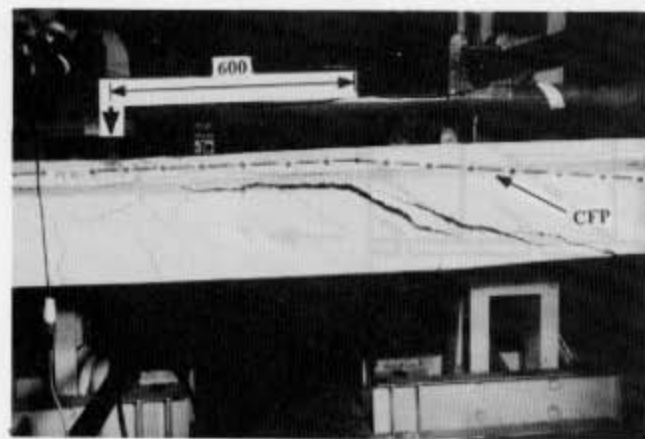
Crack pattern at failure and observed CFP of PCB1 (dimension is in mm)
